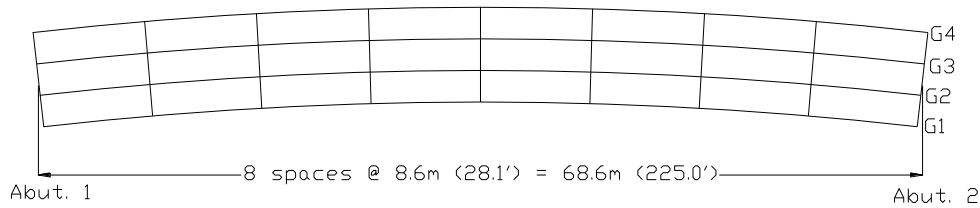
Simplified Framing Plan, Single-Span, 4-Girder, 305-m (1000-ft) Radius Bridge.
